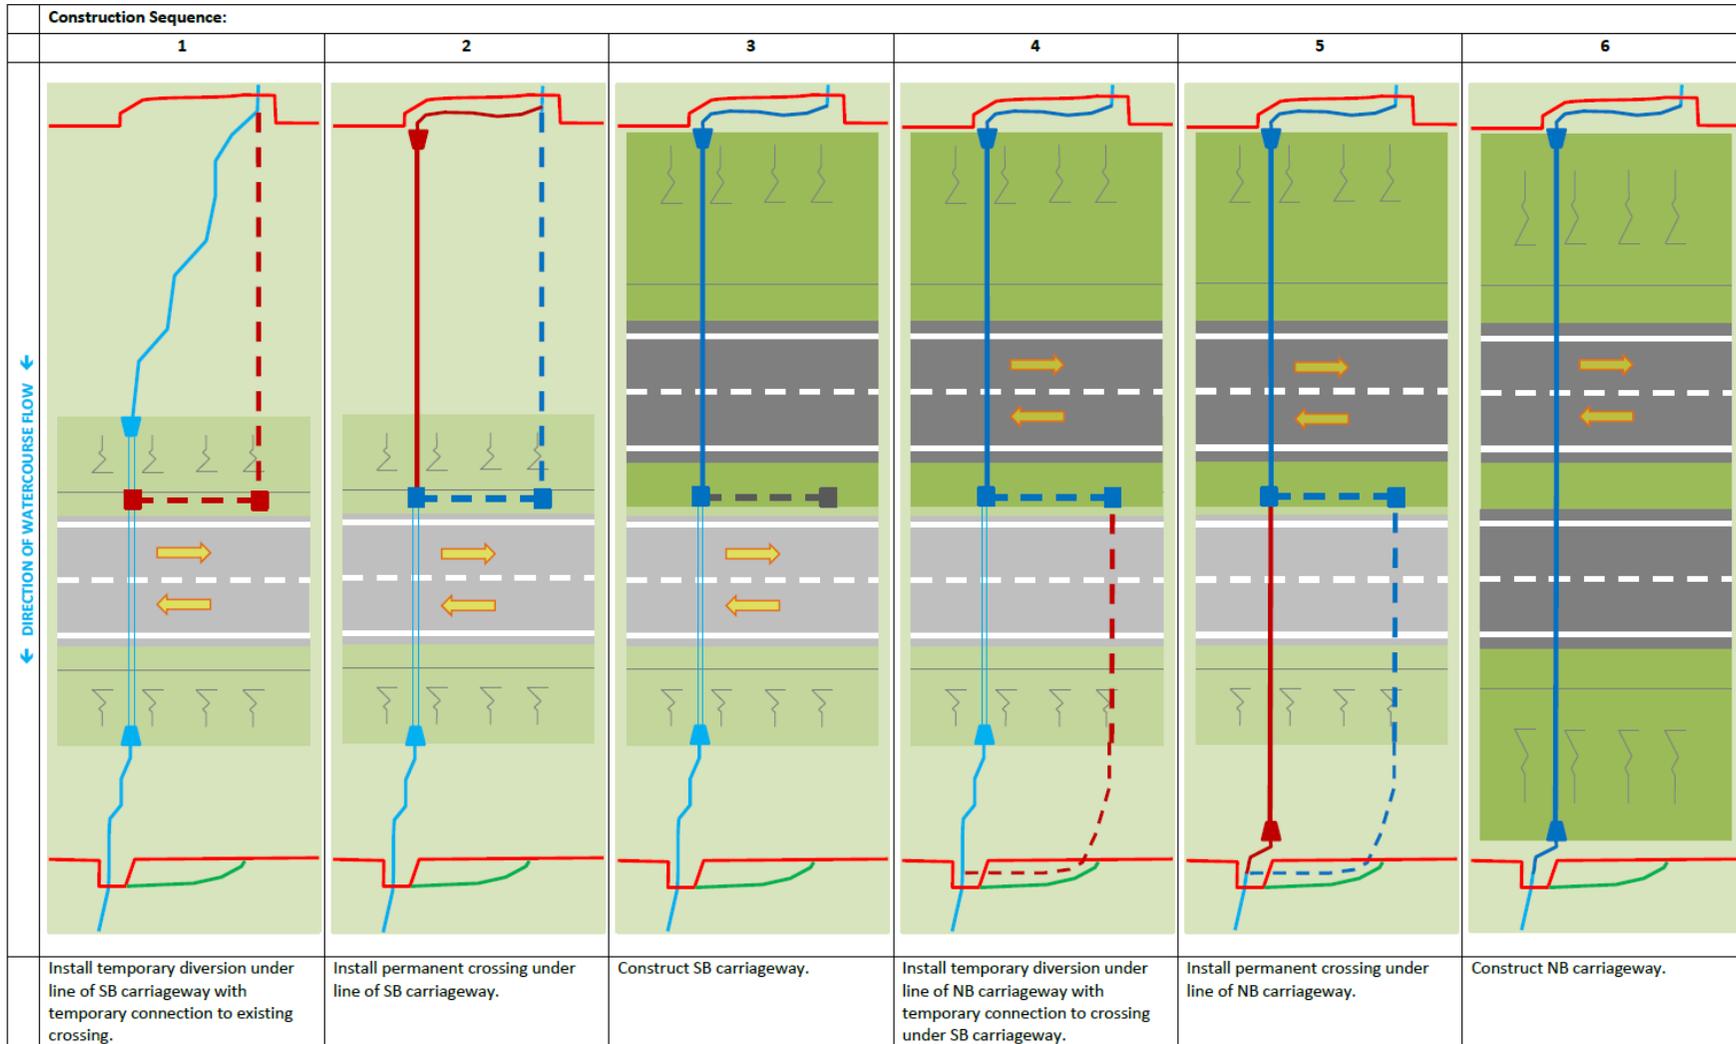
Widening to the east – road on embankment – on-line watercourse alignment
